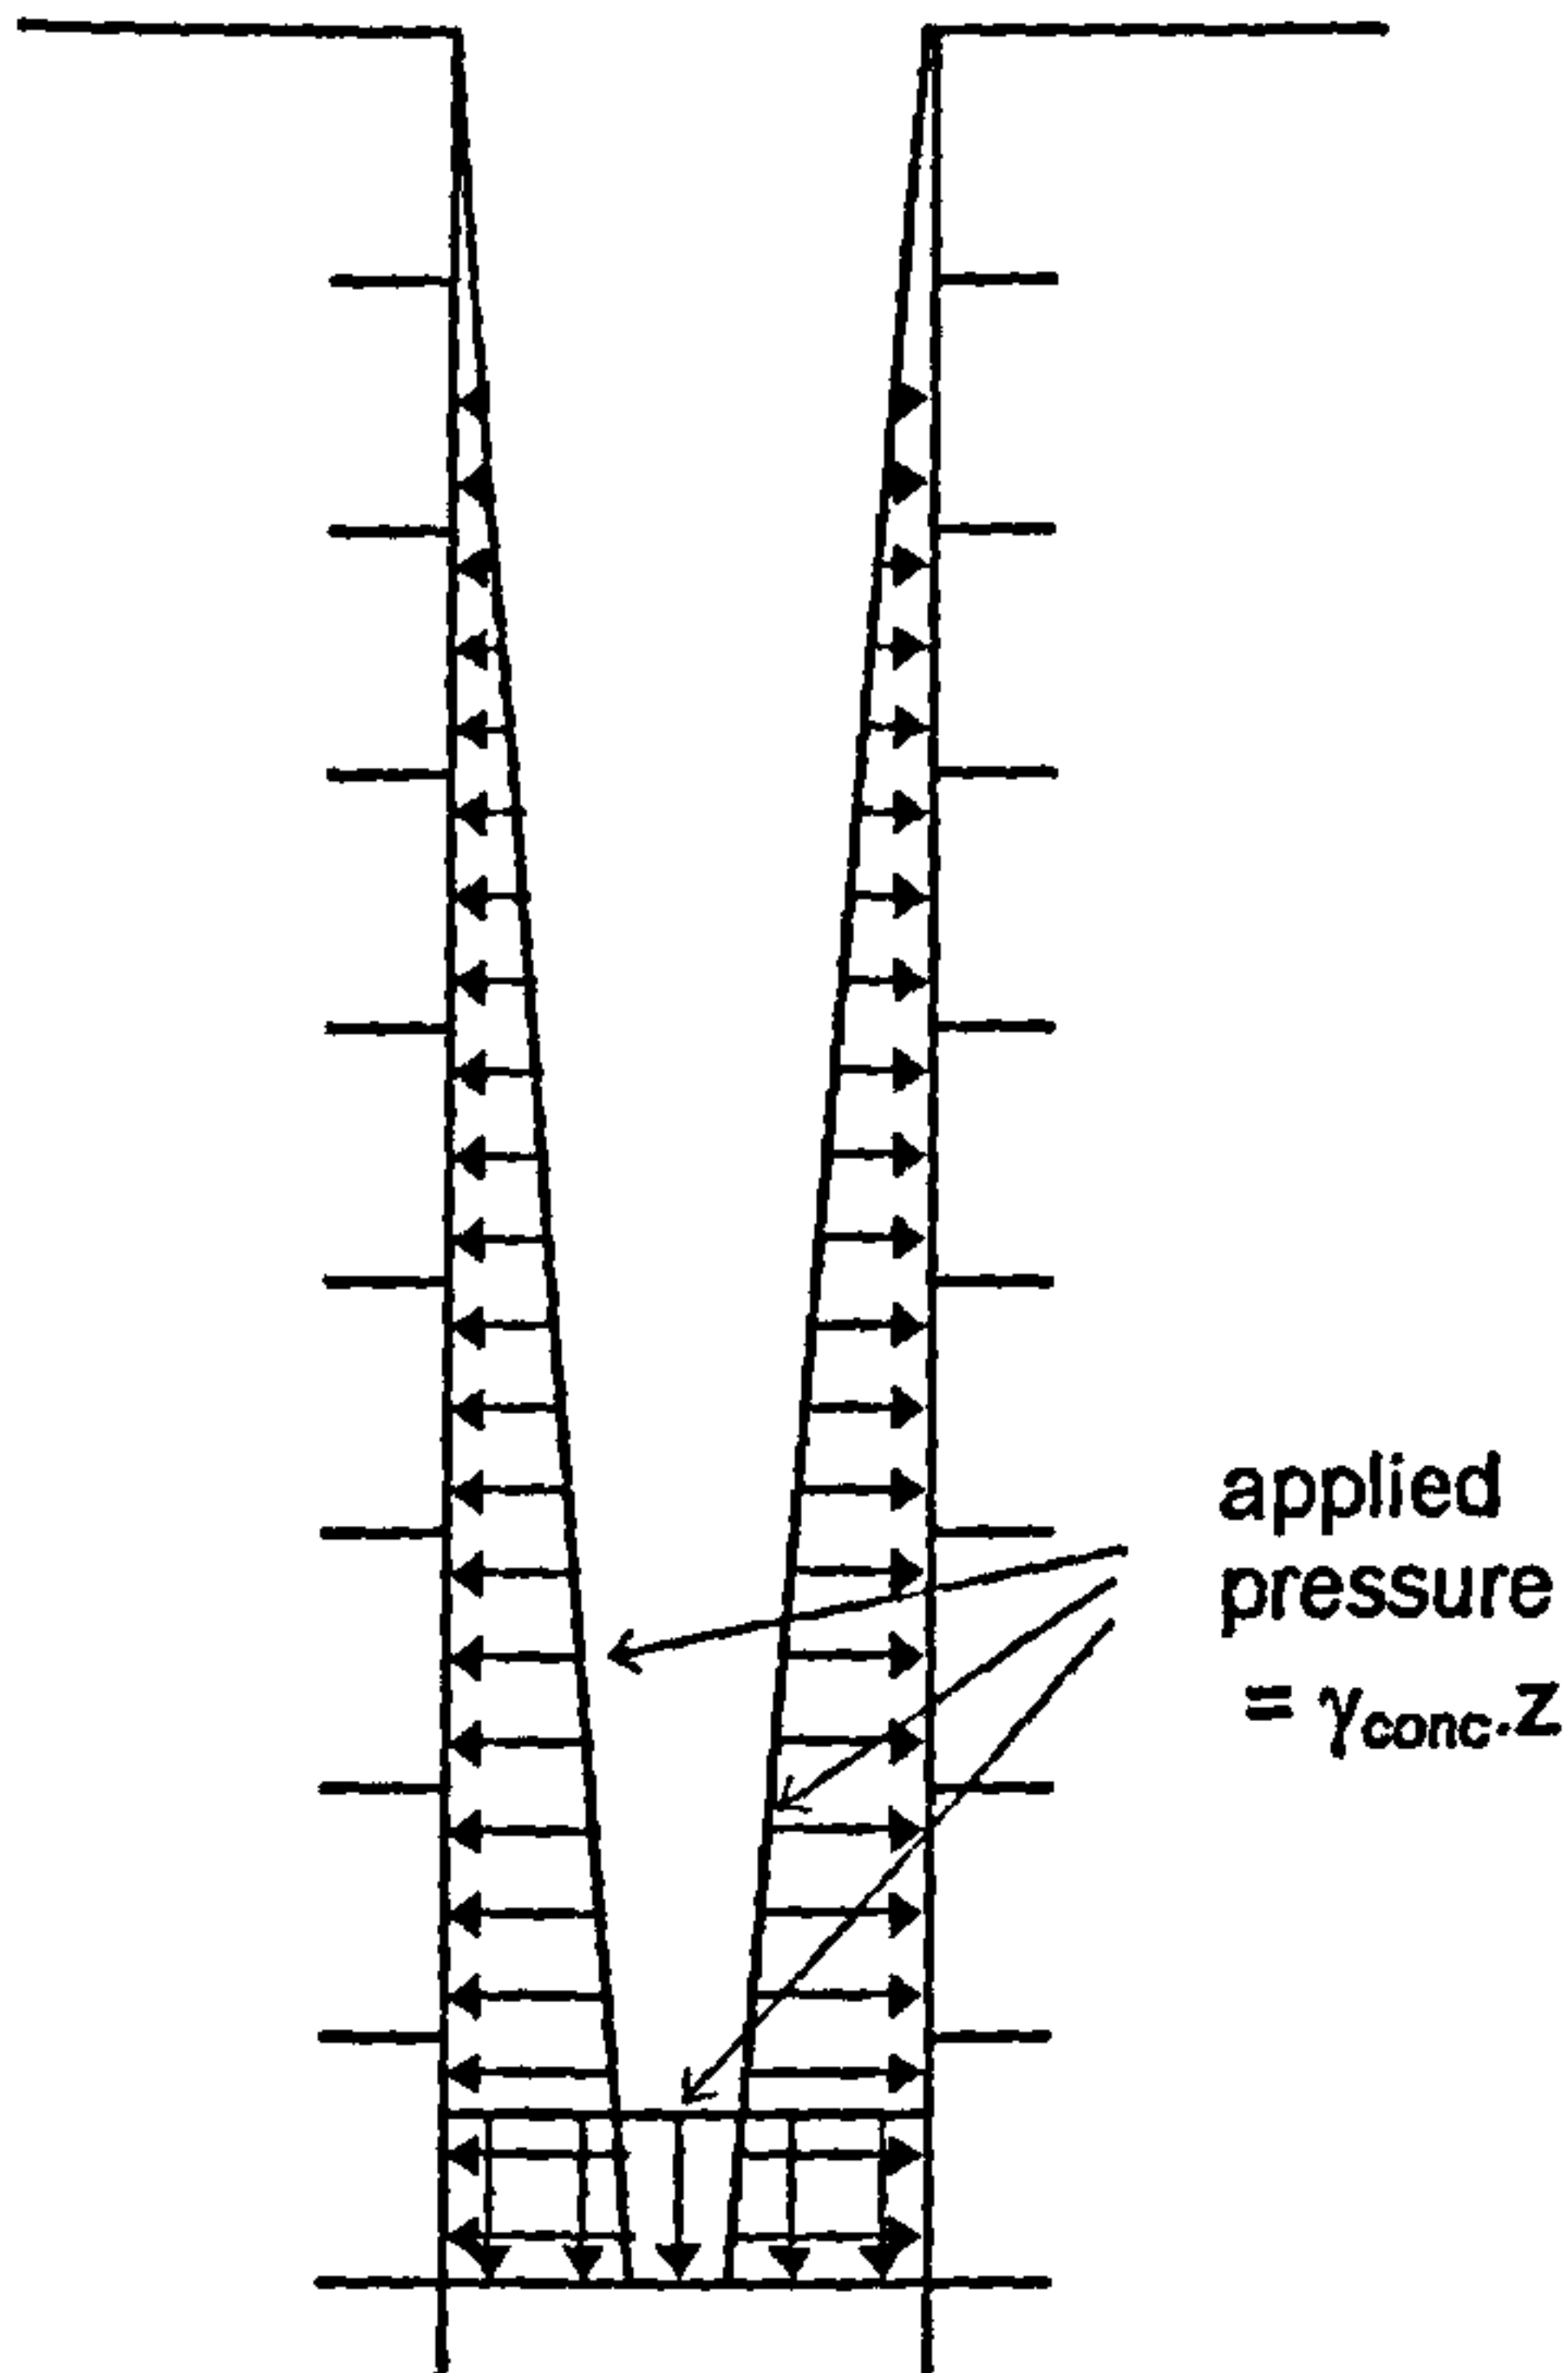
Comparison of multiple overlay and wished-in-place methods of wall installation for a cantilever wall (contd)
